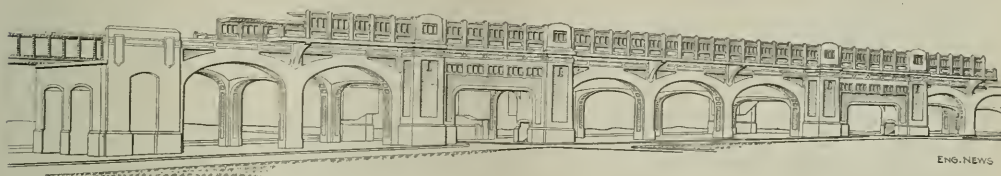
DESIGN FOR ORNAMENTAL REINFORCED-CONCRETE VIADUCT ON QUEENS BOULEVARD
